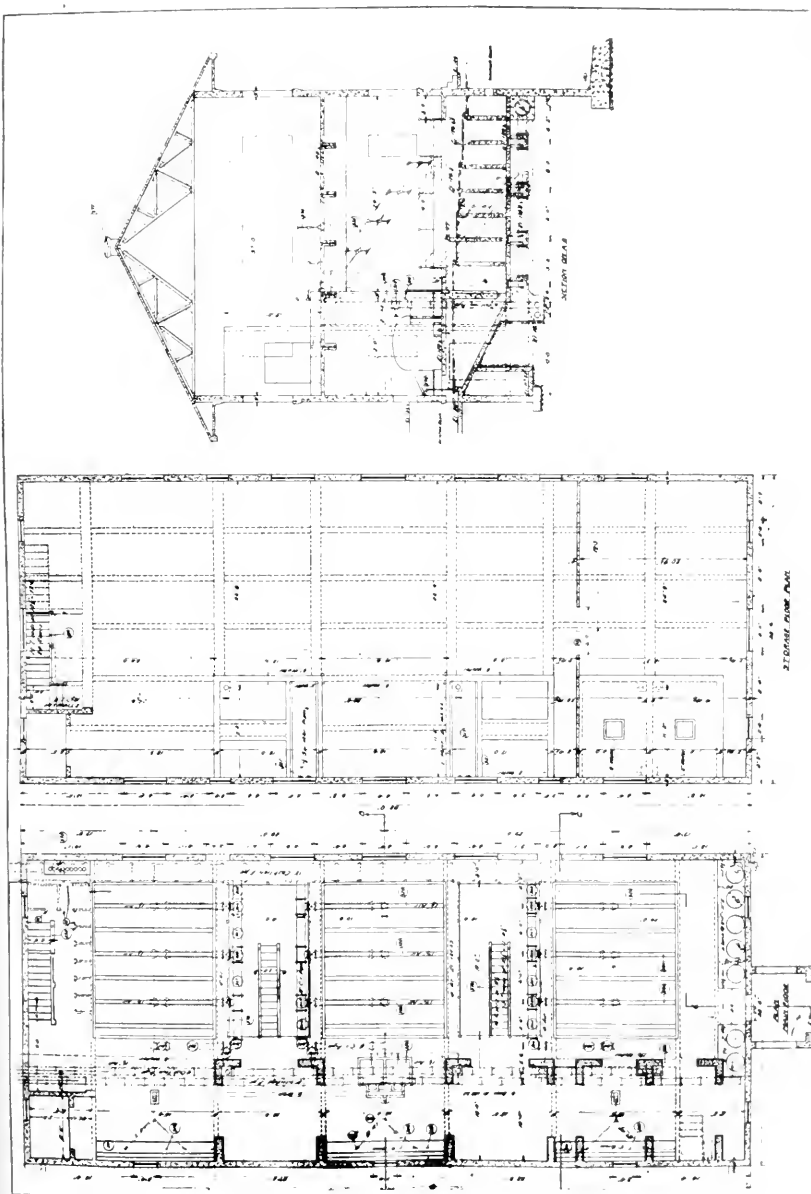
SECTION AND PLAN OF HEAD HOUSE.
